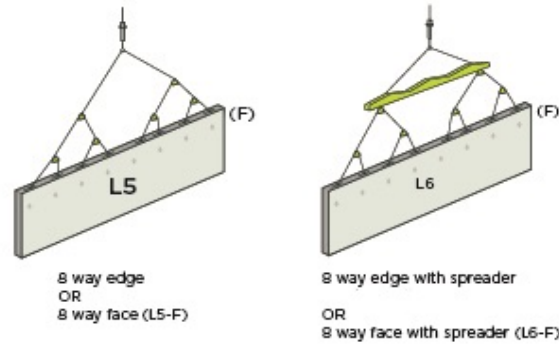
Examples of possible rigging configurations for lifting precast concrete elements ⁴
